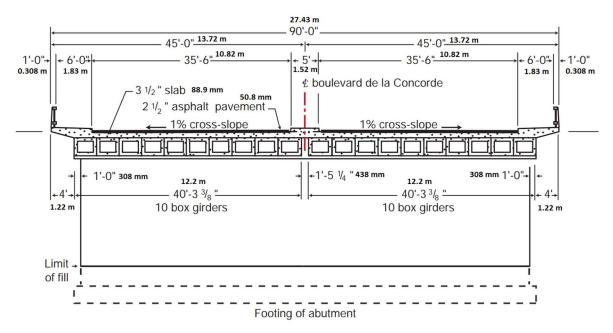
Cross-section of the de la Concorde Overpass from Autoroute (Highway) 19 [3]
